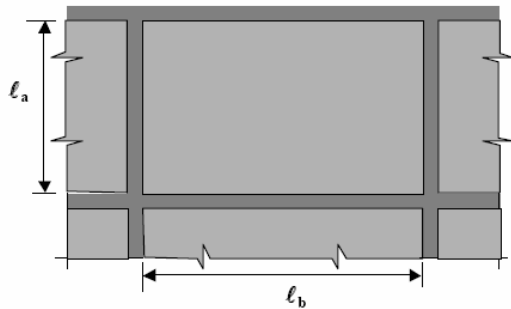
Edge panel with ℓ_b parallel to edge, of two-way slabs supported on girders, beams or walls
